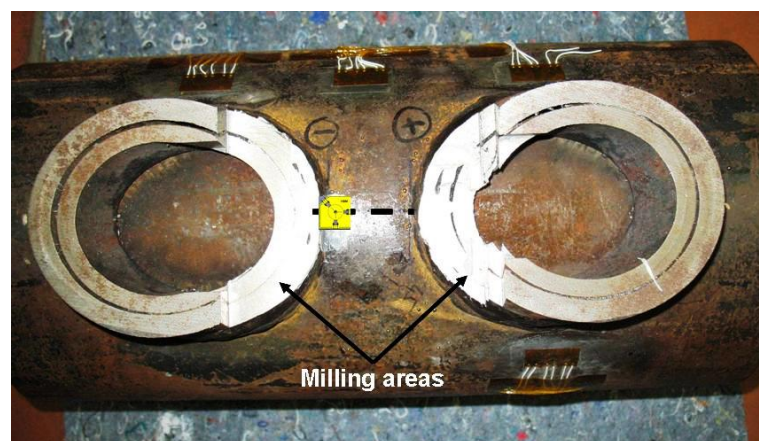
As-welded sample AW-30 after milling part of the braces.
